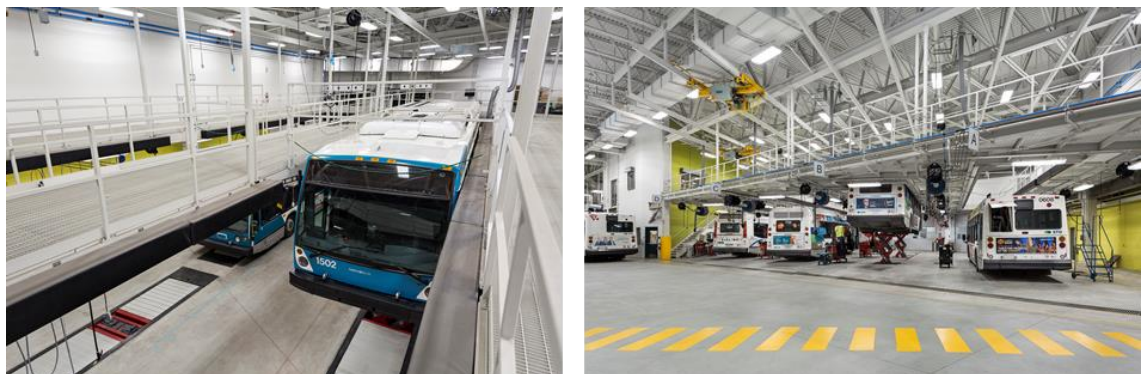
Example of roof access footbridge – STO Workshop, Canada (source: architecture office Cobalt 27)
